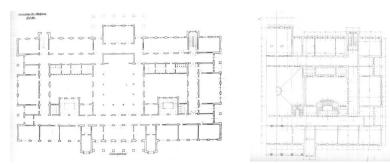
a)Gazi Education Institute First Floor Plan, b)Gazi Education Institute Third Floor Plan (half of the floor plan) [42]
